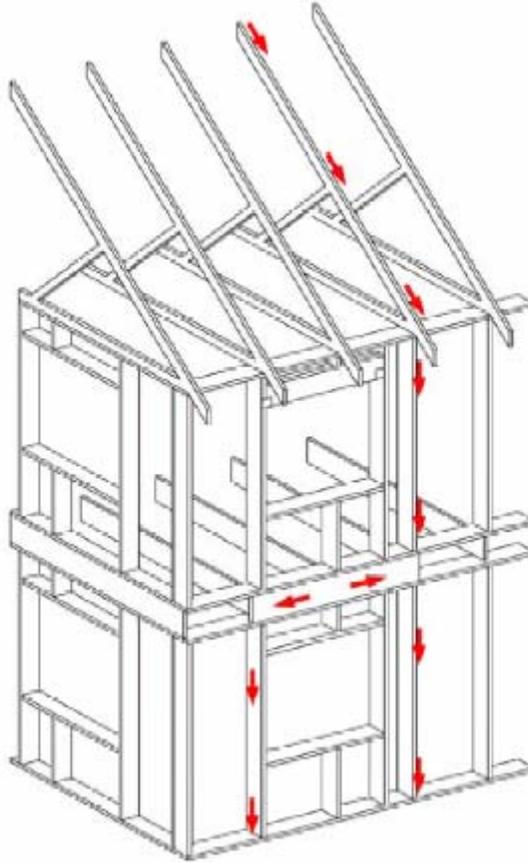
Advanced framing showing truss alignment with stud framing and single top plates
